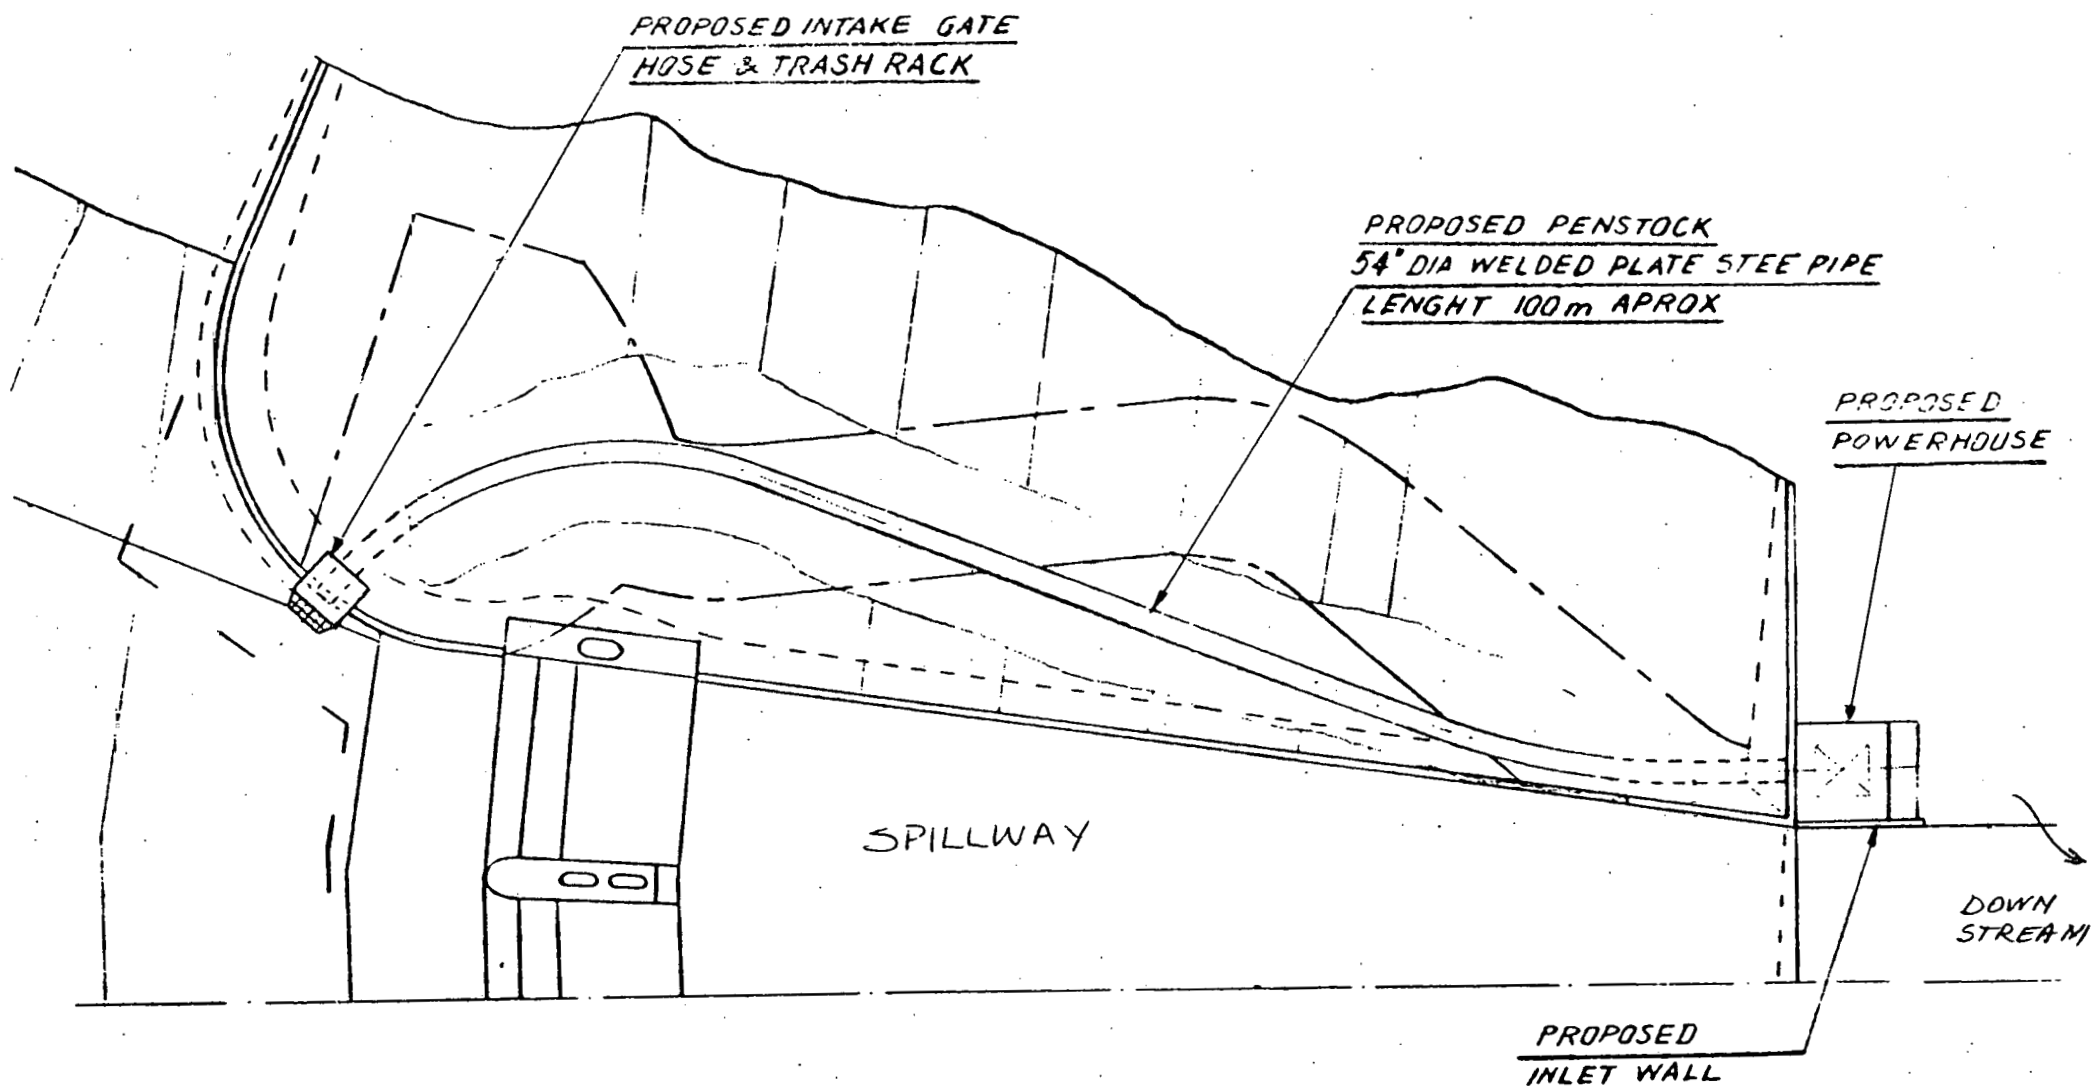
Existing spillway and location of proposed hydropower facility (Site 2). View from above.
